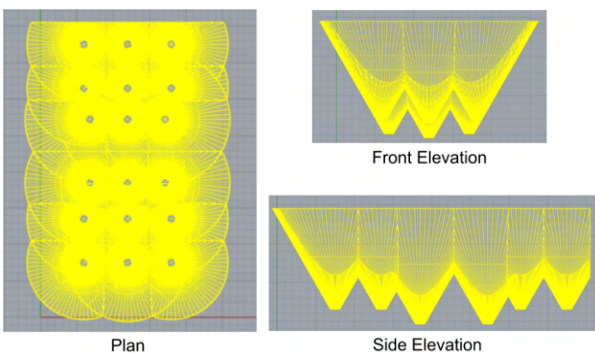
Parametric modelling of mobilised group cone (conical failure) for irregular pile lengths and layout.
